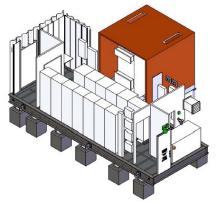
Cutaway View of the gas turbine control enclosure showing electrical equipment and protected air conditioning system
